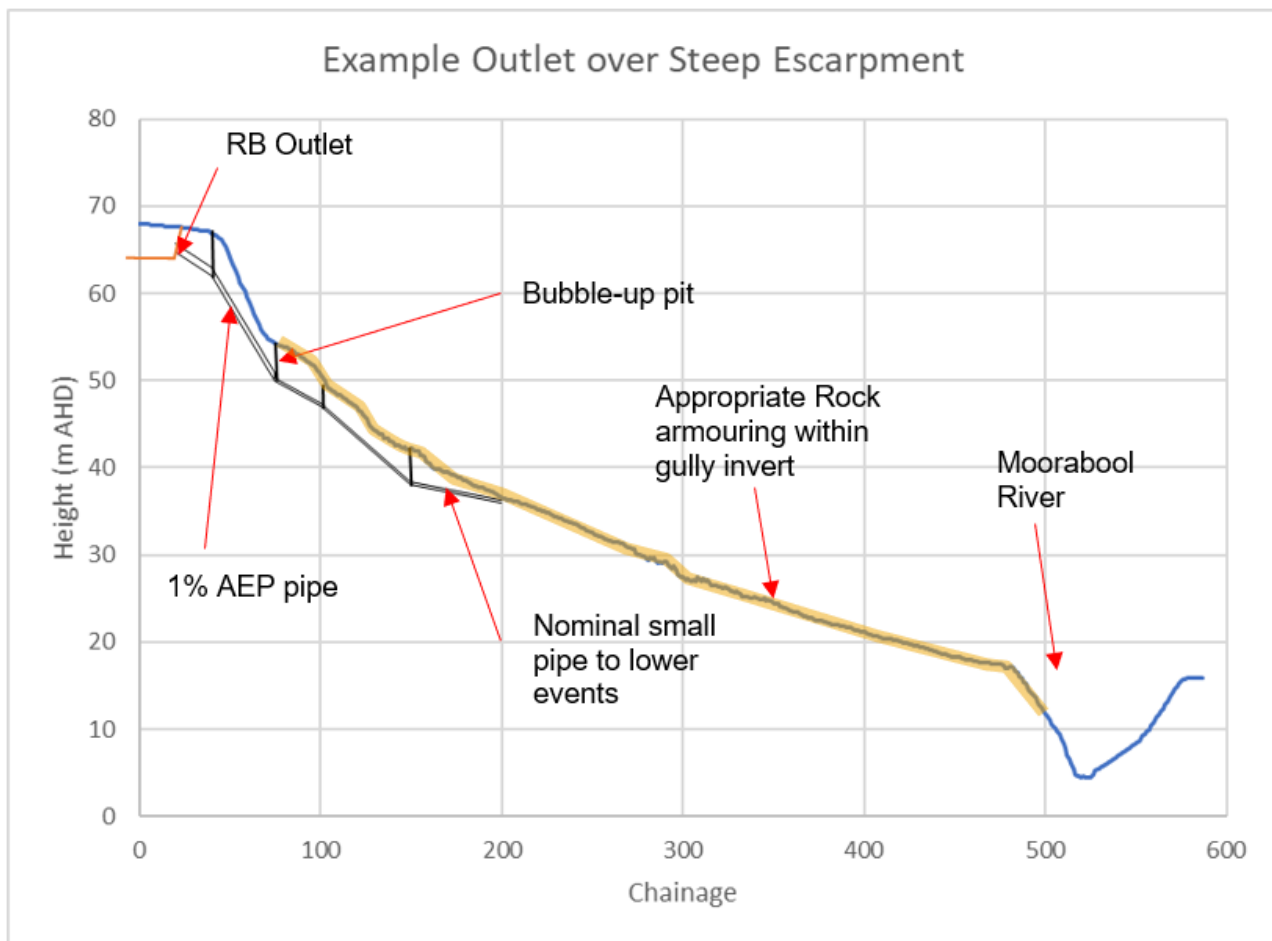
EXAMPLE RB OUTLET AT ESCARPMENT LOCATION
